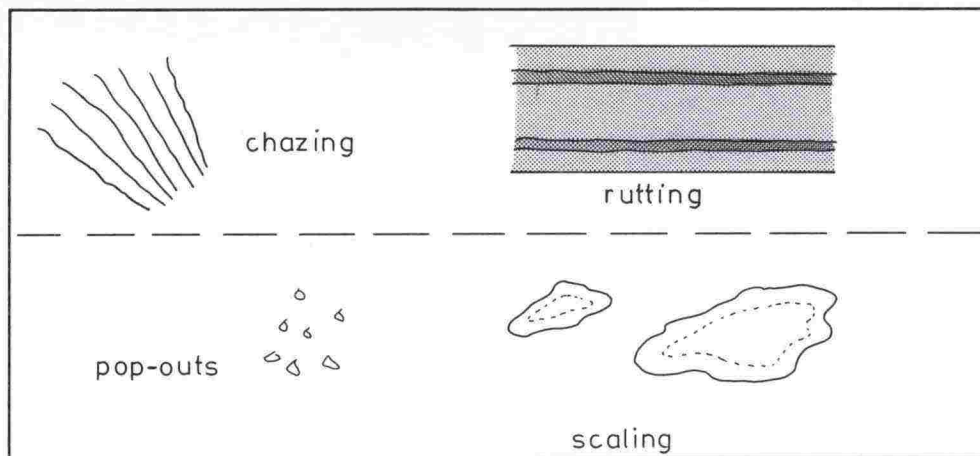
b. The most common surface defects of concrete pavements
